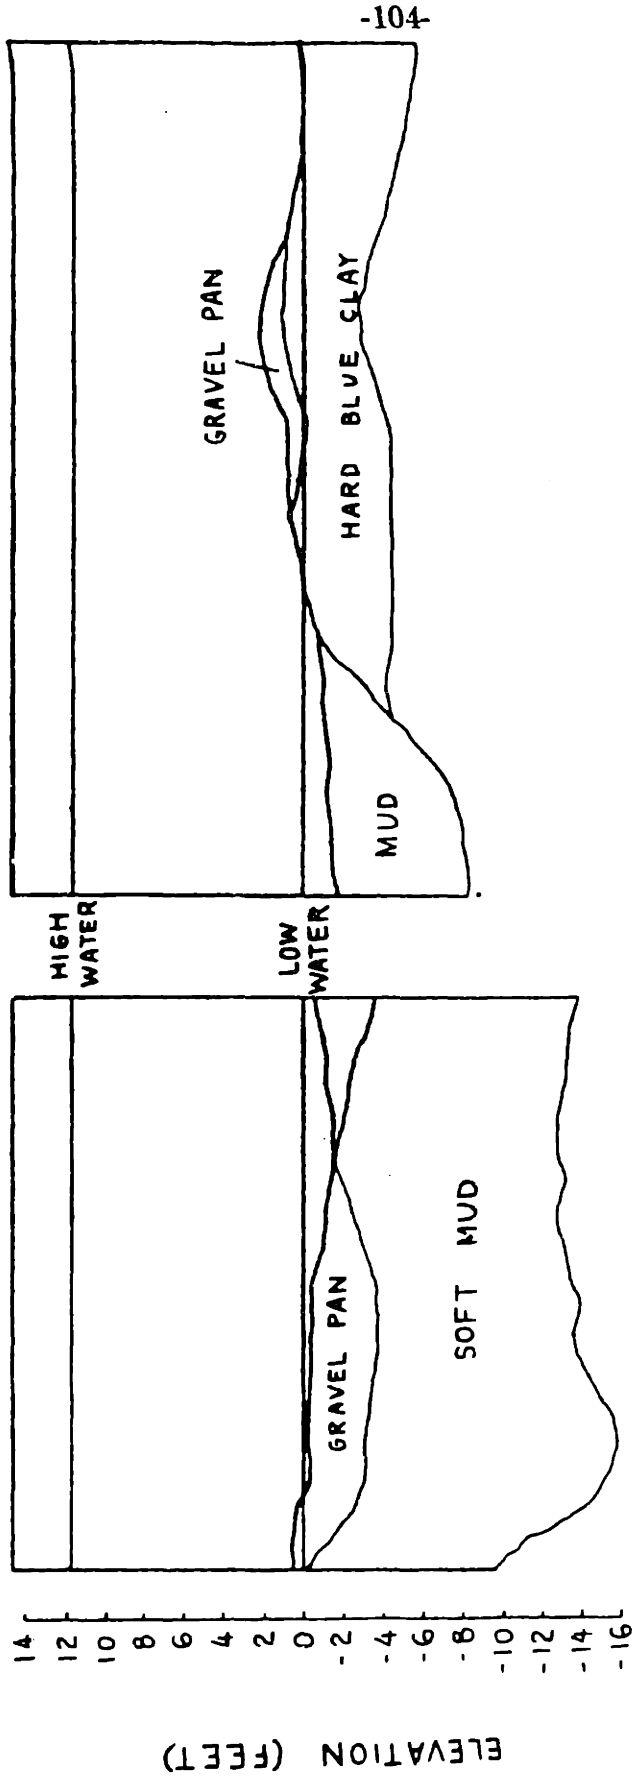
Prefill Cross-section of South Boston Flats (Parrott, George B., 1849)
